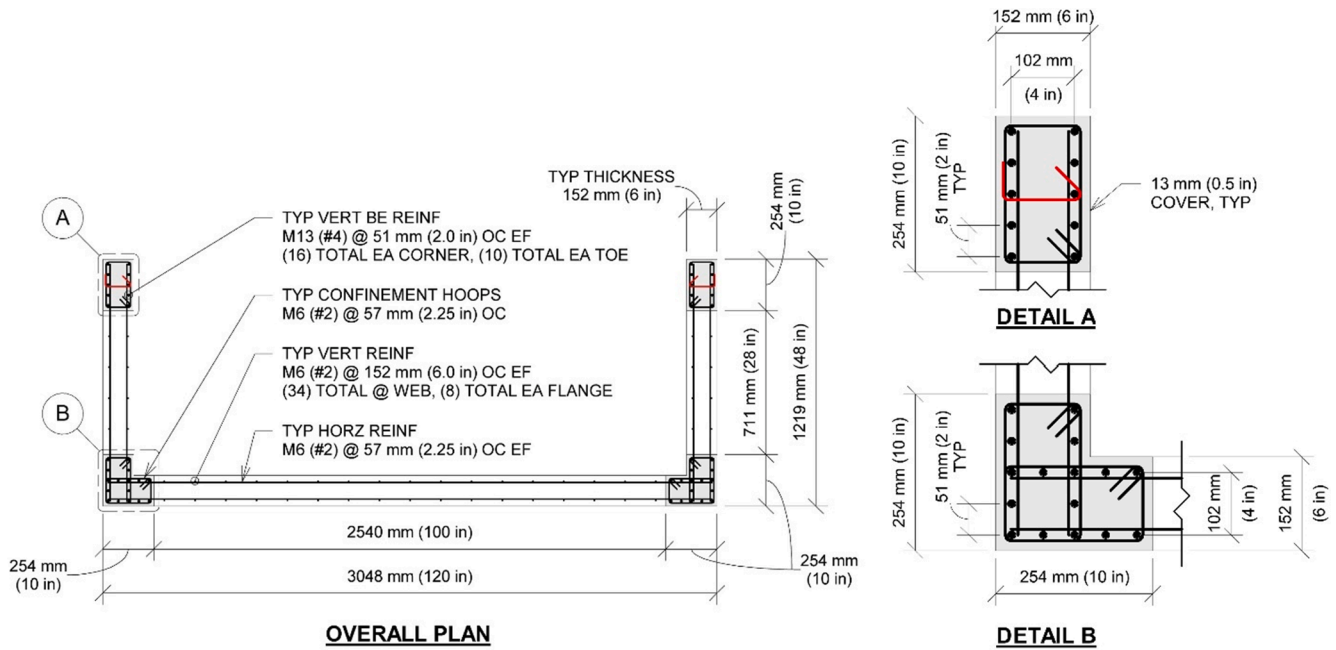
Geometry and reinforcement for C-shaped walls with boundary element details.
